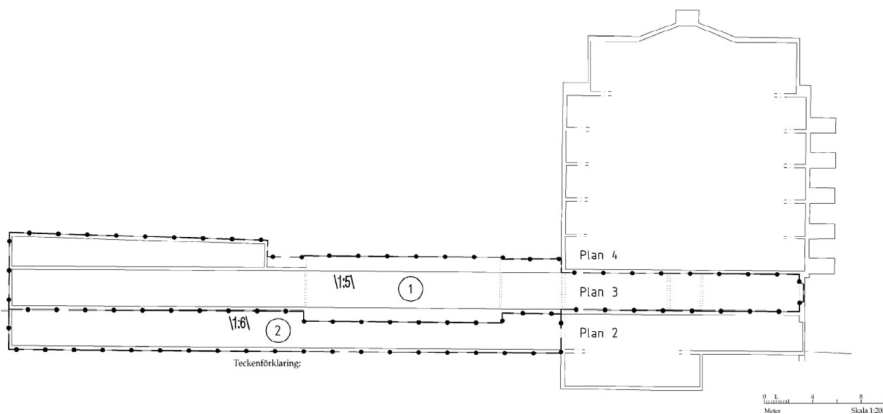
Example of 3D subdivision of a building creating separate ownership rights for horizontal properties: Offices (Plan 2), parking facilities (Plan 3) and dwelling purposes (Plan 4). Source: Lantmäteriet, the Swedish mapping, cadastral and land registration authority.
